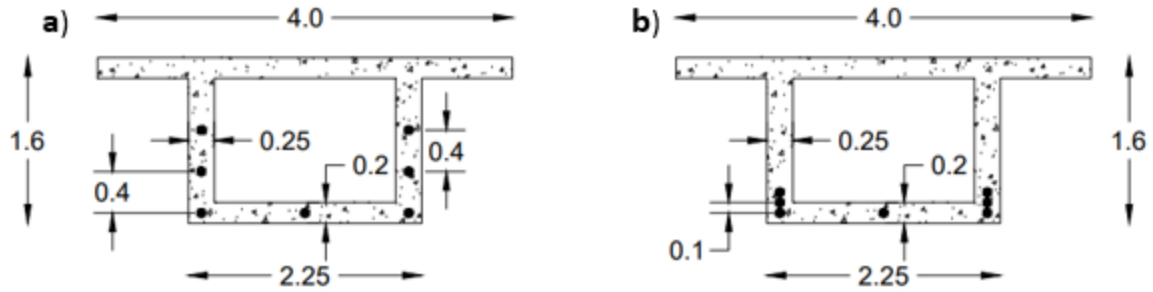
Bridge cross section at a) support and b) Midspan. All dimensions in meters.
